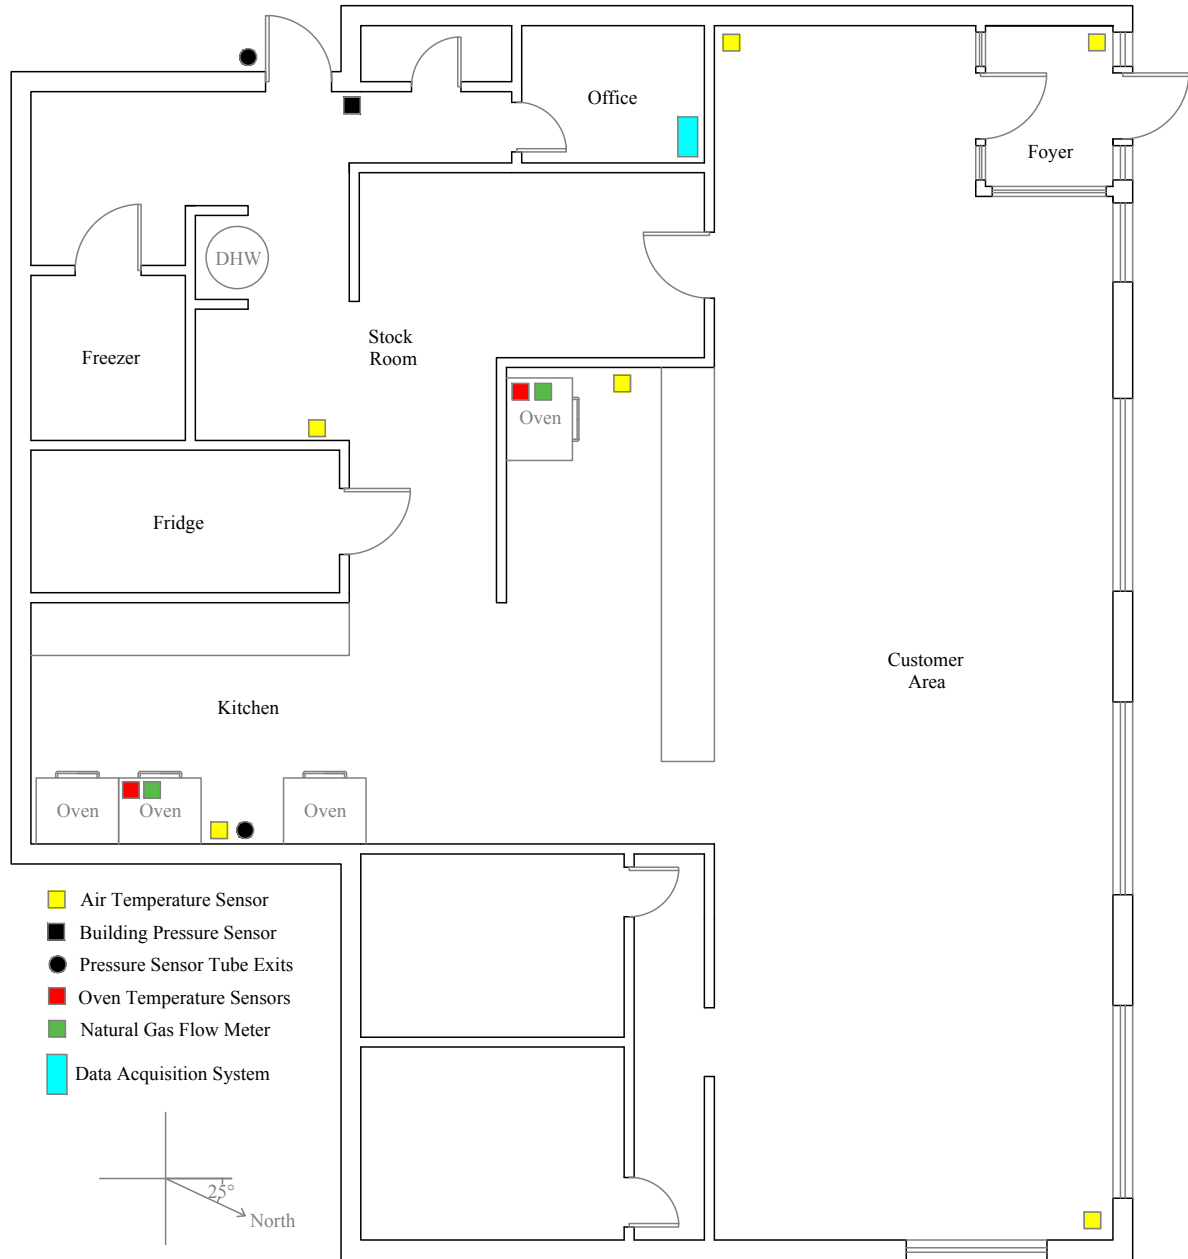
Building Floor Plan and Instrumentation Schematic – Store B
